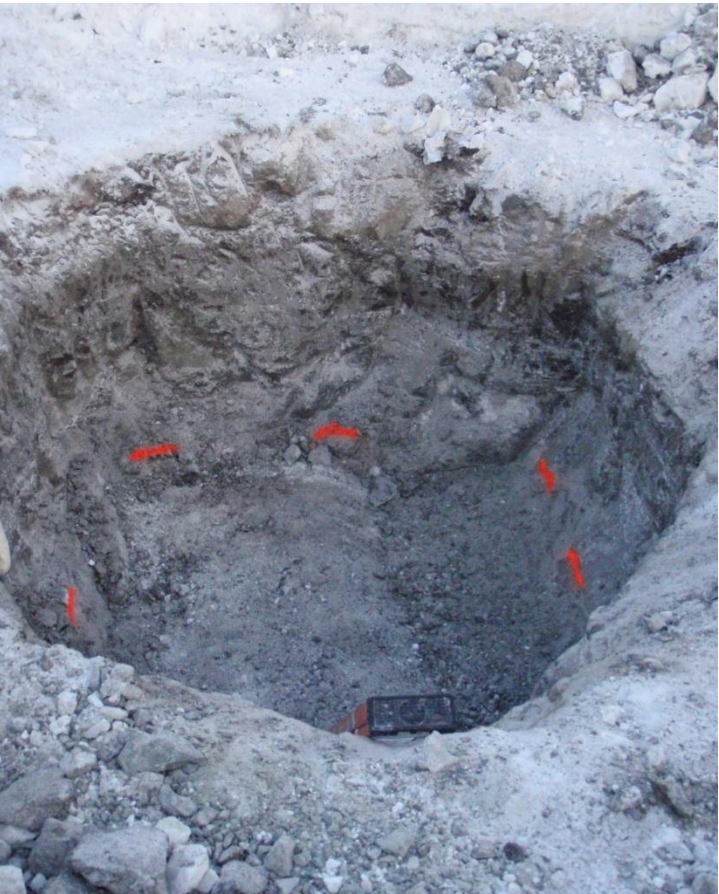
Close-up view of Sump #2 excavation. Note the base elevation of the culvert painted on the side slopes of the excavation.
